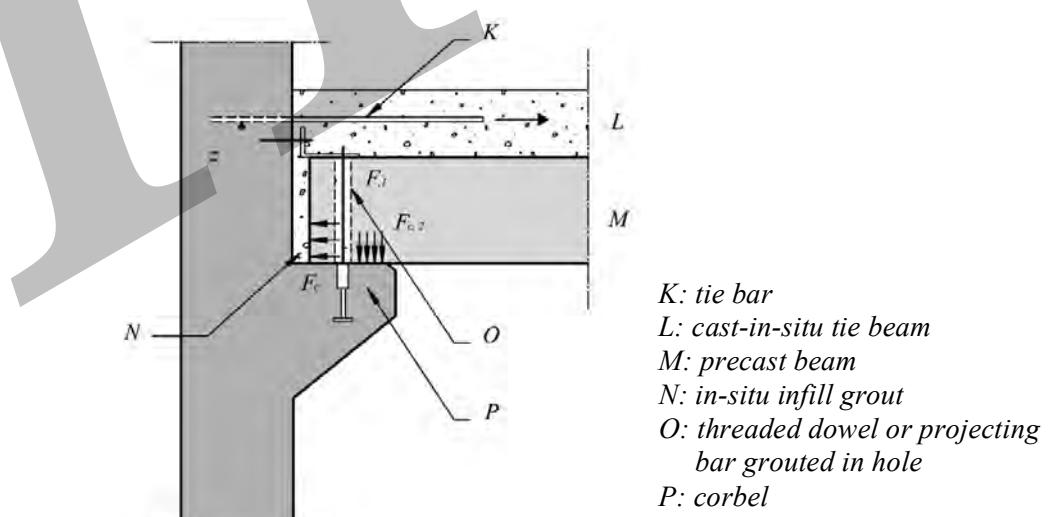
Structural mechanism for the beam-end connection with the column. The solution presented is complex and therefore not recommended.
